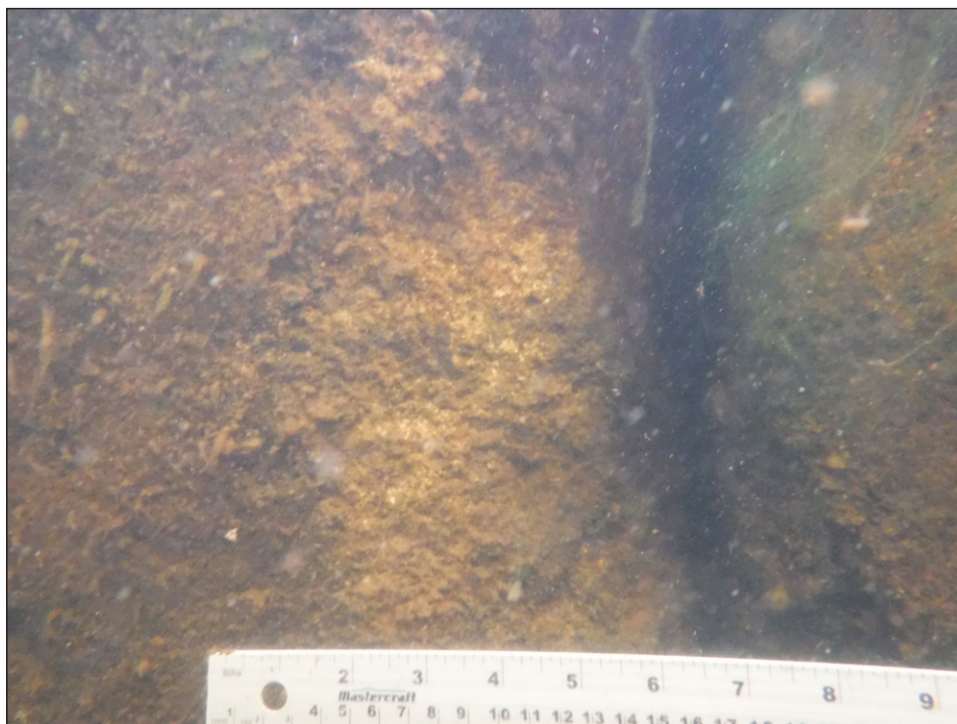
Spall 1 m below surface at north end of Rest Pier, spall severity typical for Rest Pier
